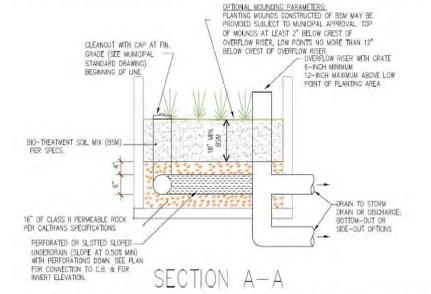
Cross section A-A of flow-through planter, shows side view of underdrain (Not to Scale)
